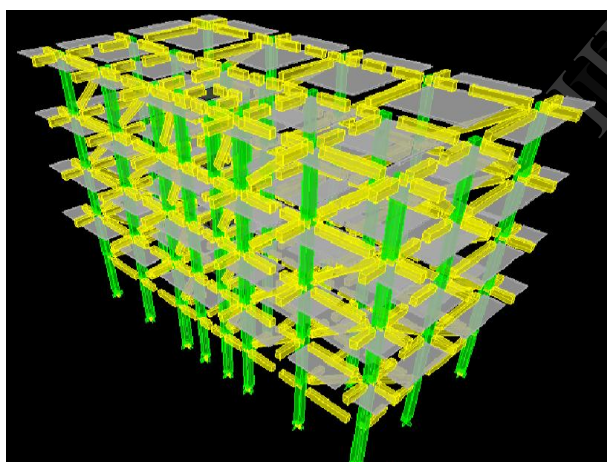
3D view of RCC Building with diagonal strut (masonry infill)
